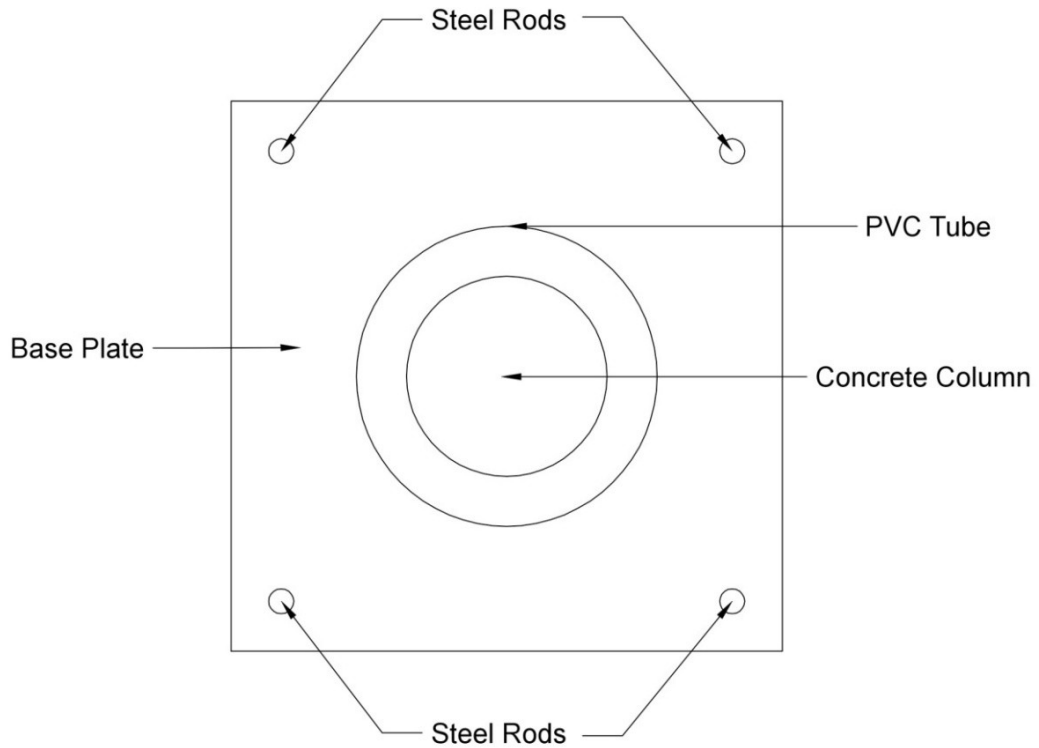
Plan View of Test Frame Base Plate (Seth Roswurm, 2013)
